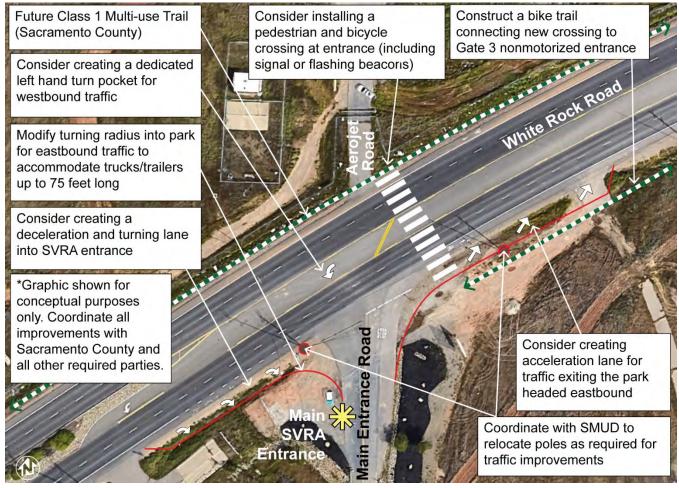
Proposed Improvements to White Rock Road at the Main Entrance
